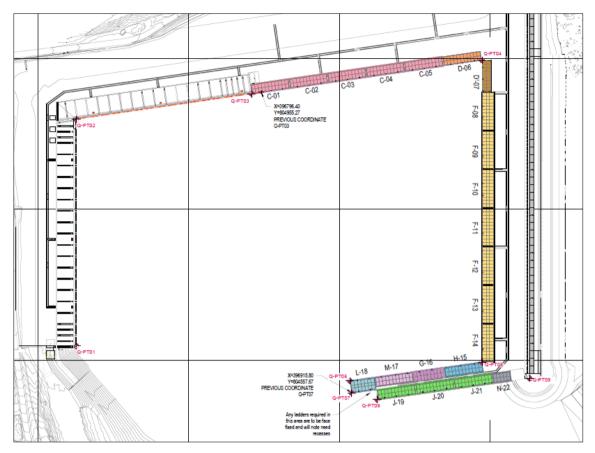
Closed and Open Quay General Arrangement (North top of page)
